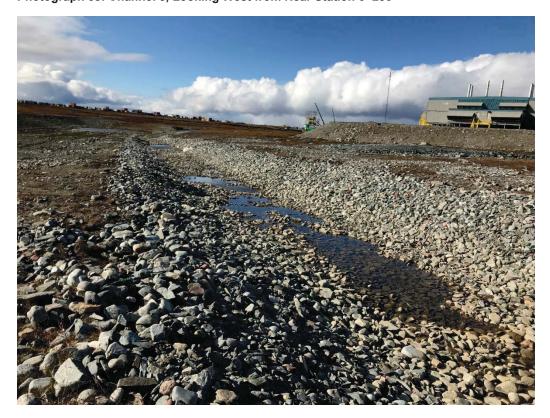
Channel 5, Looking Northeast from Near Station 0+250 (12 September 2018)
